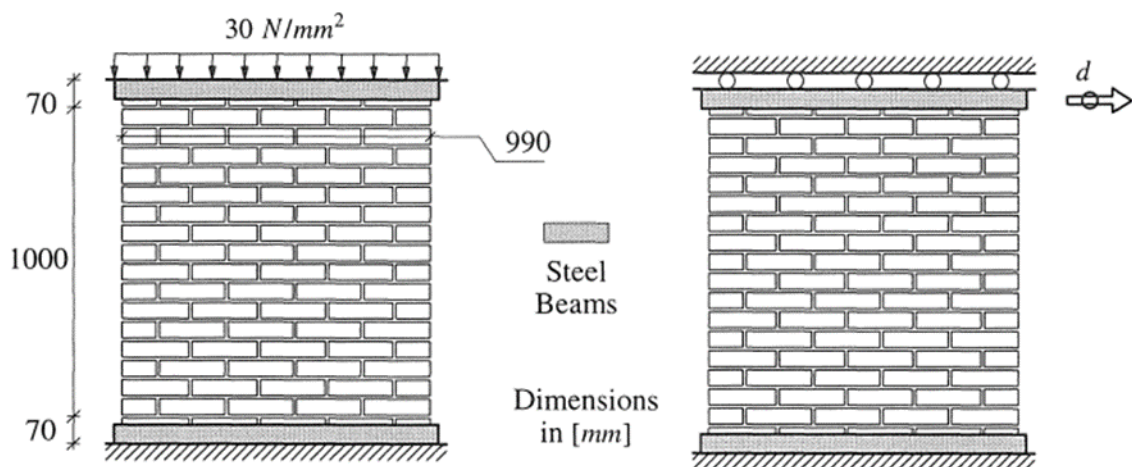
Vertical loading of the wall (left) and horizontal loading of the wall (right) (Lourenço et al., 1995)
